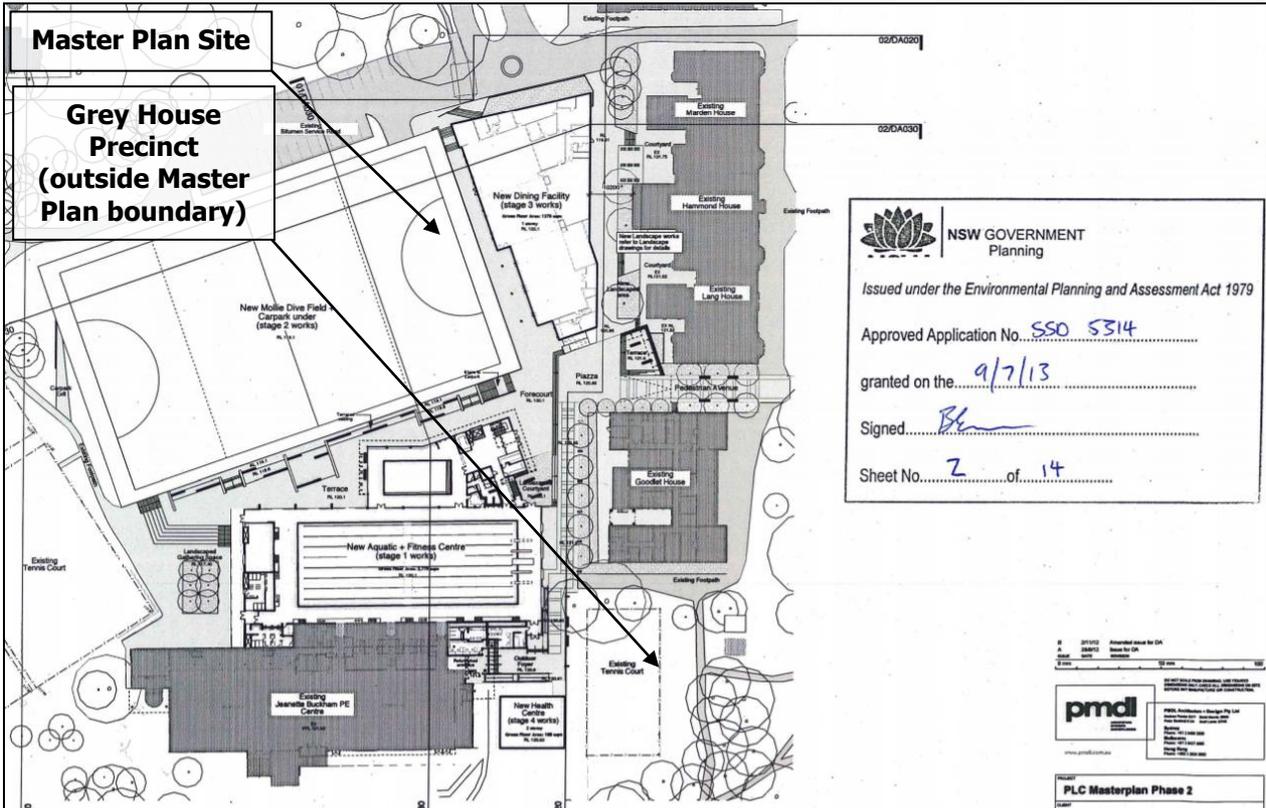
SSD 5314 Stamped Site Plan (PMDL 2012)
